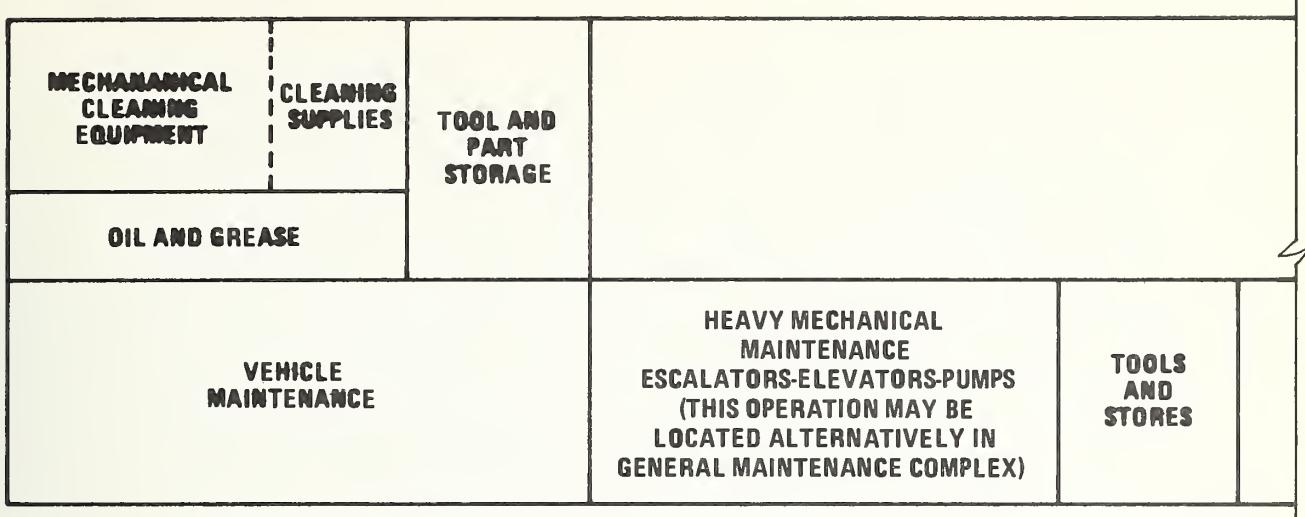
FLOOR PLAN OF STATION CLEANING FACILITIES
